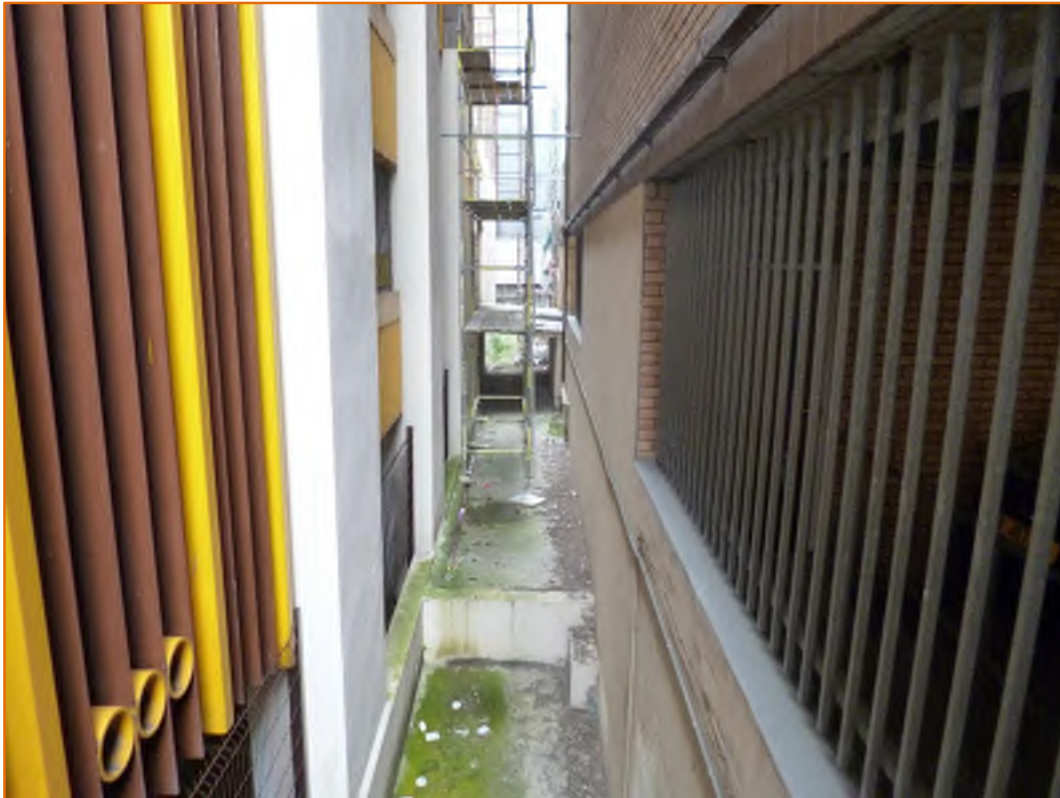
Image showing gap between south-western edge of multi-storey car park and adjacent building.
